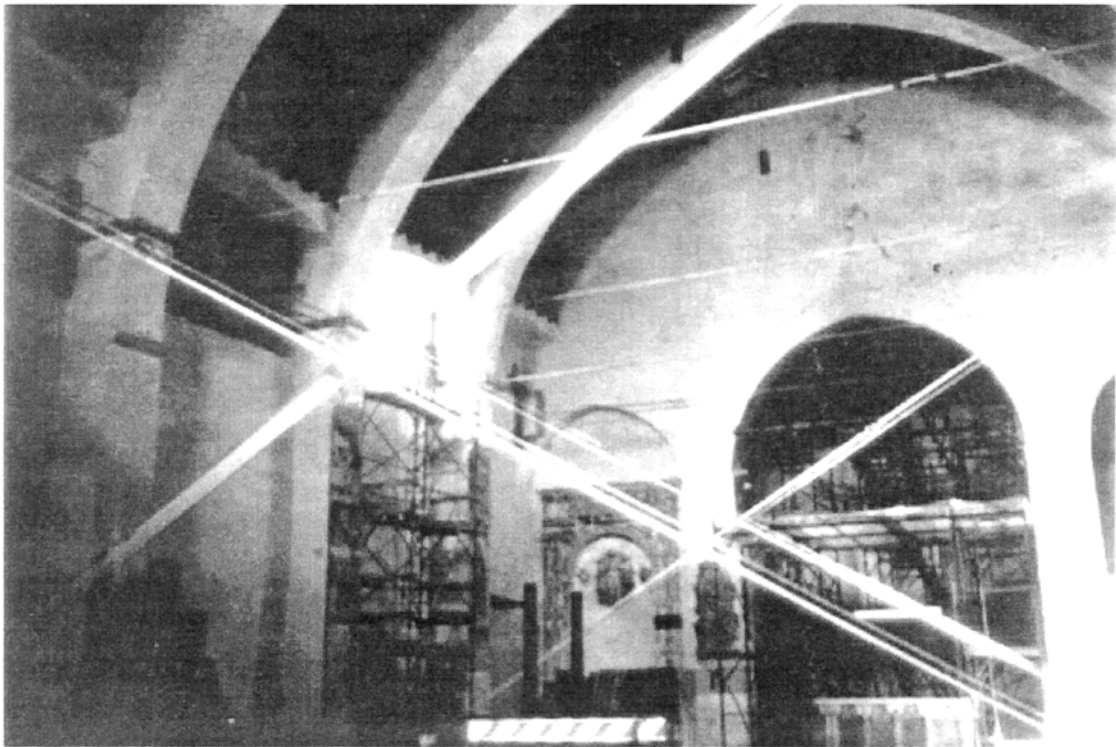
Pinacoteca, Nocera Umbra: diagonal bracing to contain thrust and prevent further damage in structural vaults
